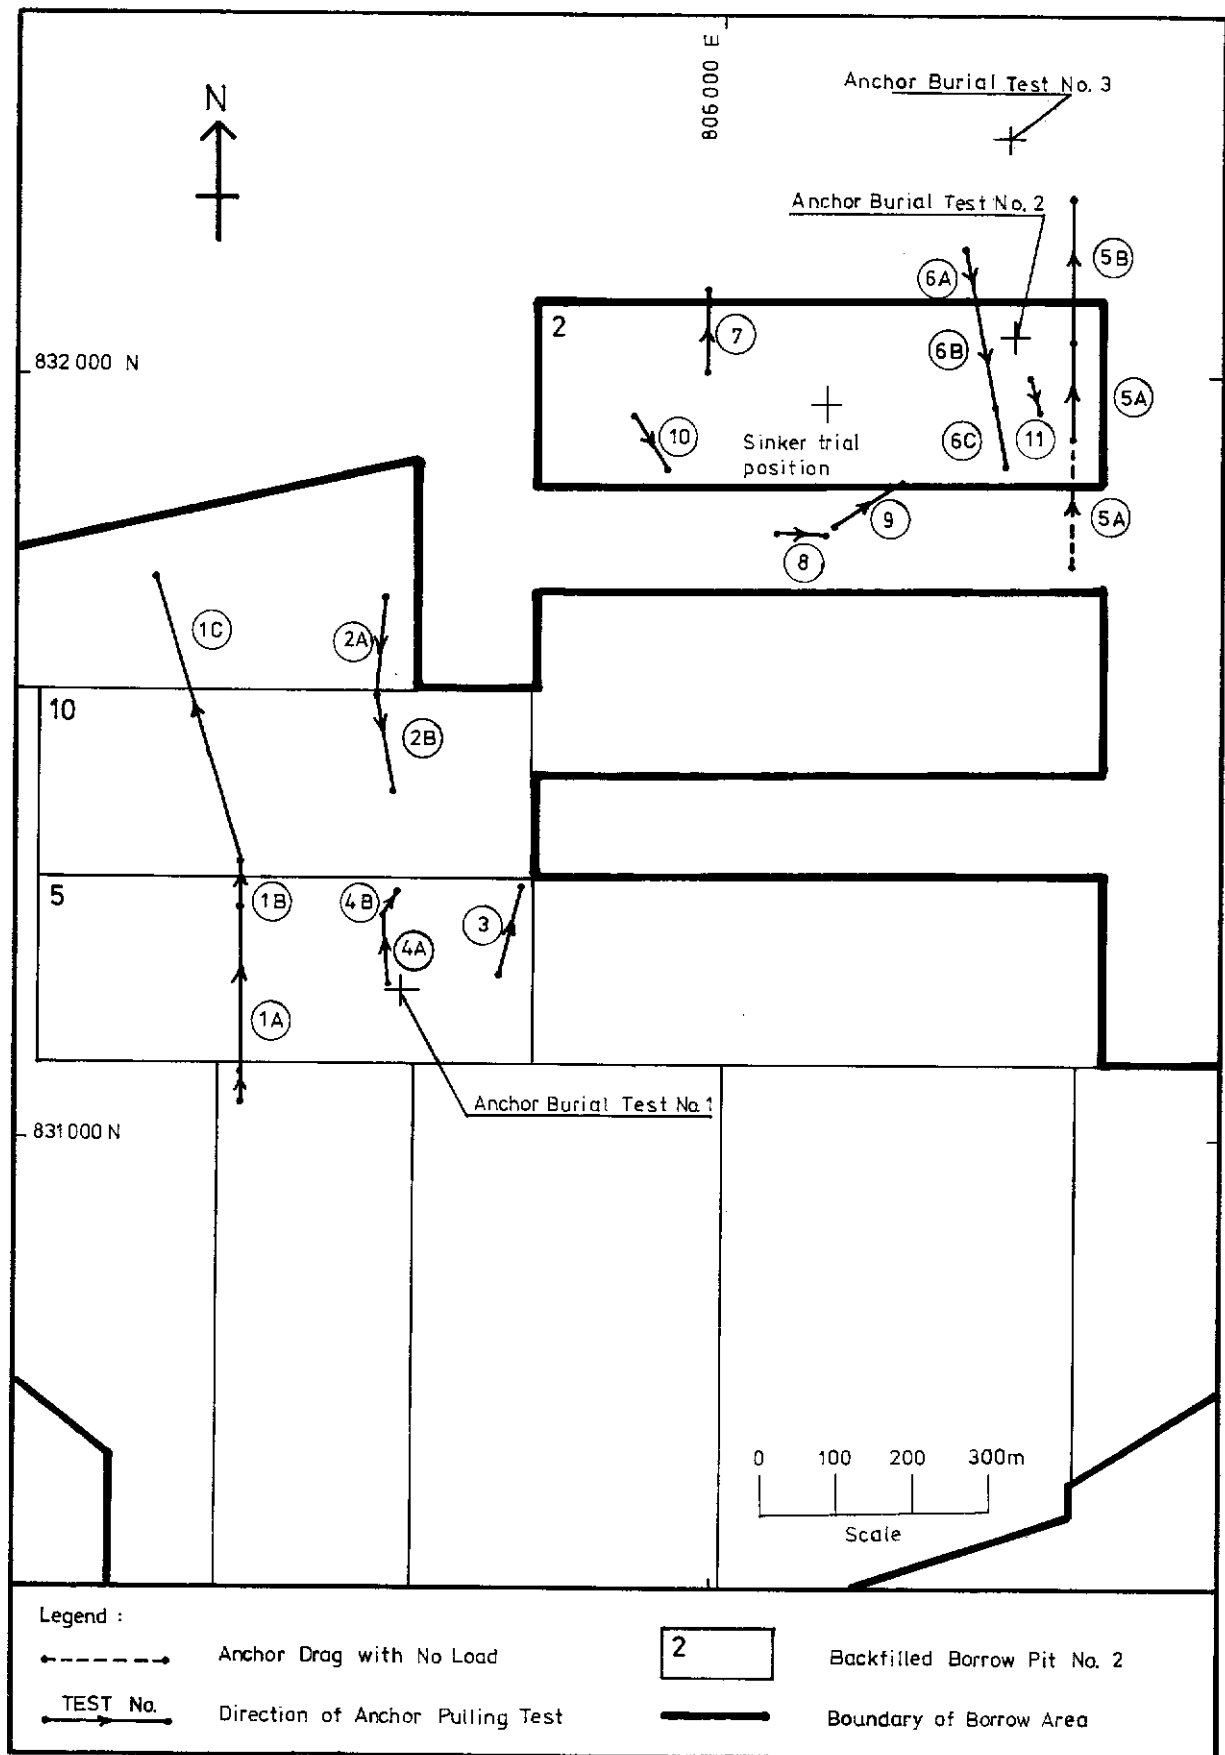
Locations of Anchor and Sinker Mooring Trials at Urmston Road
